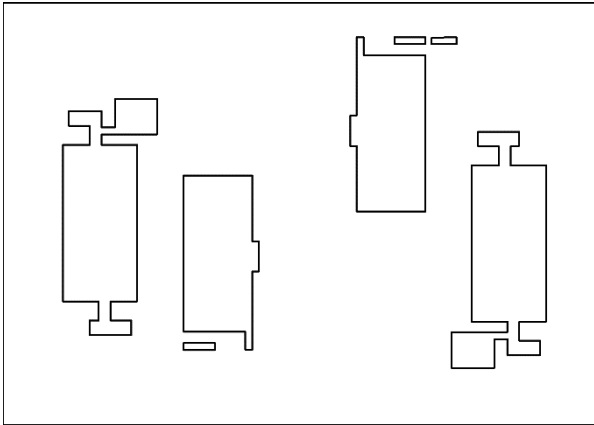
Example of a floor plan of a Brazilian Youth Prison - Form E
